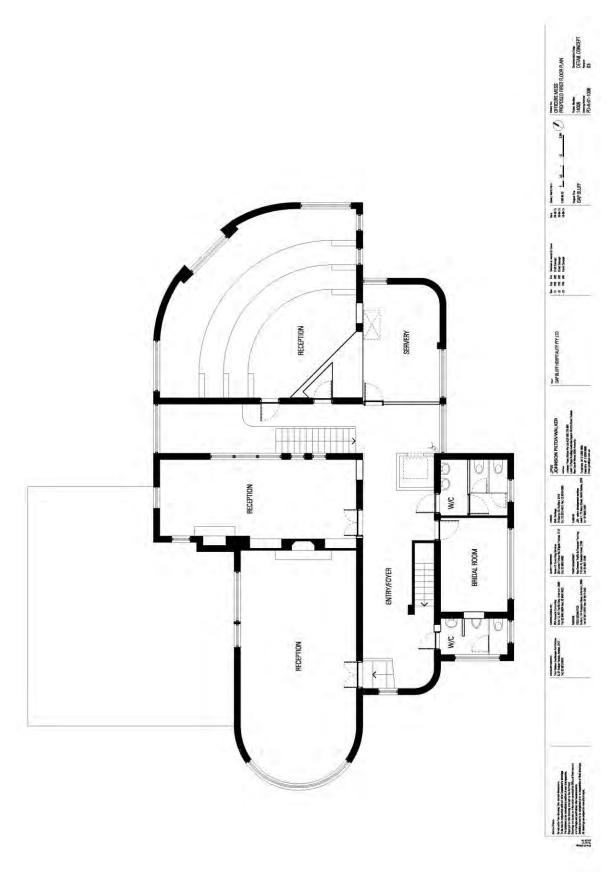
Proposed first floor plan for the Officers' Mess. (Source: JPW 2015)
